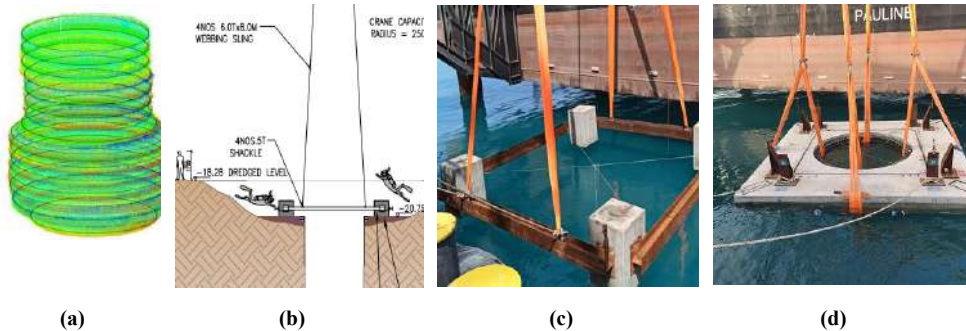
(a) on completion of the riser shaft drilling the BHA was then removed, and a three-dimensional survey carried out to determine the exact dimensions and position of the riser shaft; (b) the next stage was to install a steel casing into the top 3 m of the riser shaft, to provide stability and prevent collapsing of the shaft inwards; (c) Four Concrete manifold foundation blocks were then positioned and levelled into the correct requirements and connected to the steel casing; (d) a manifold concrete base slab was then positioned on top manifold foundation blocks.
